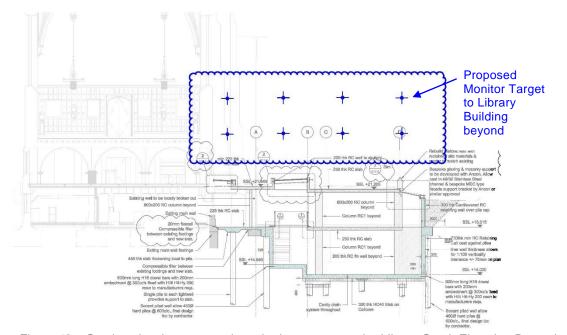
Section showing proposed monitoring targets on the Library South Elevation Beyond
